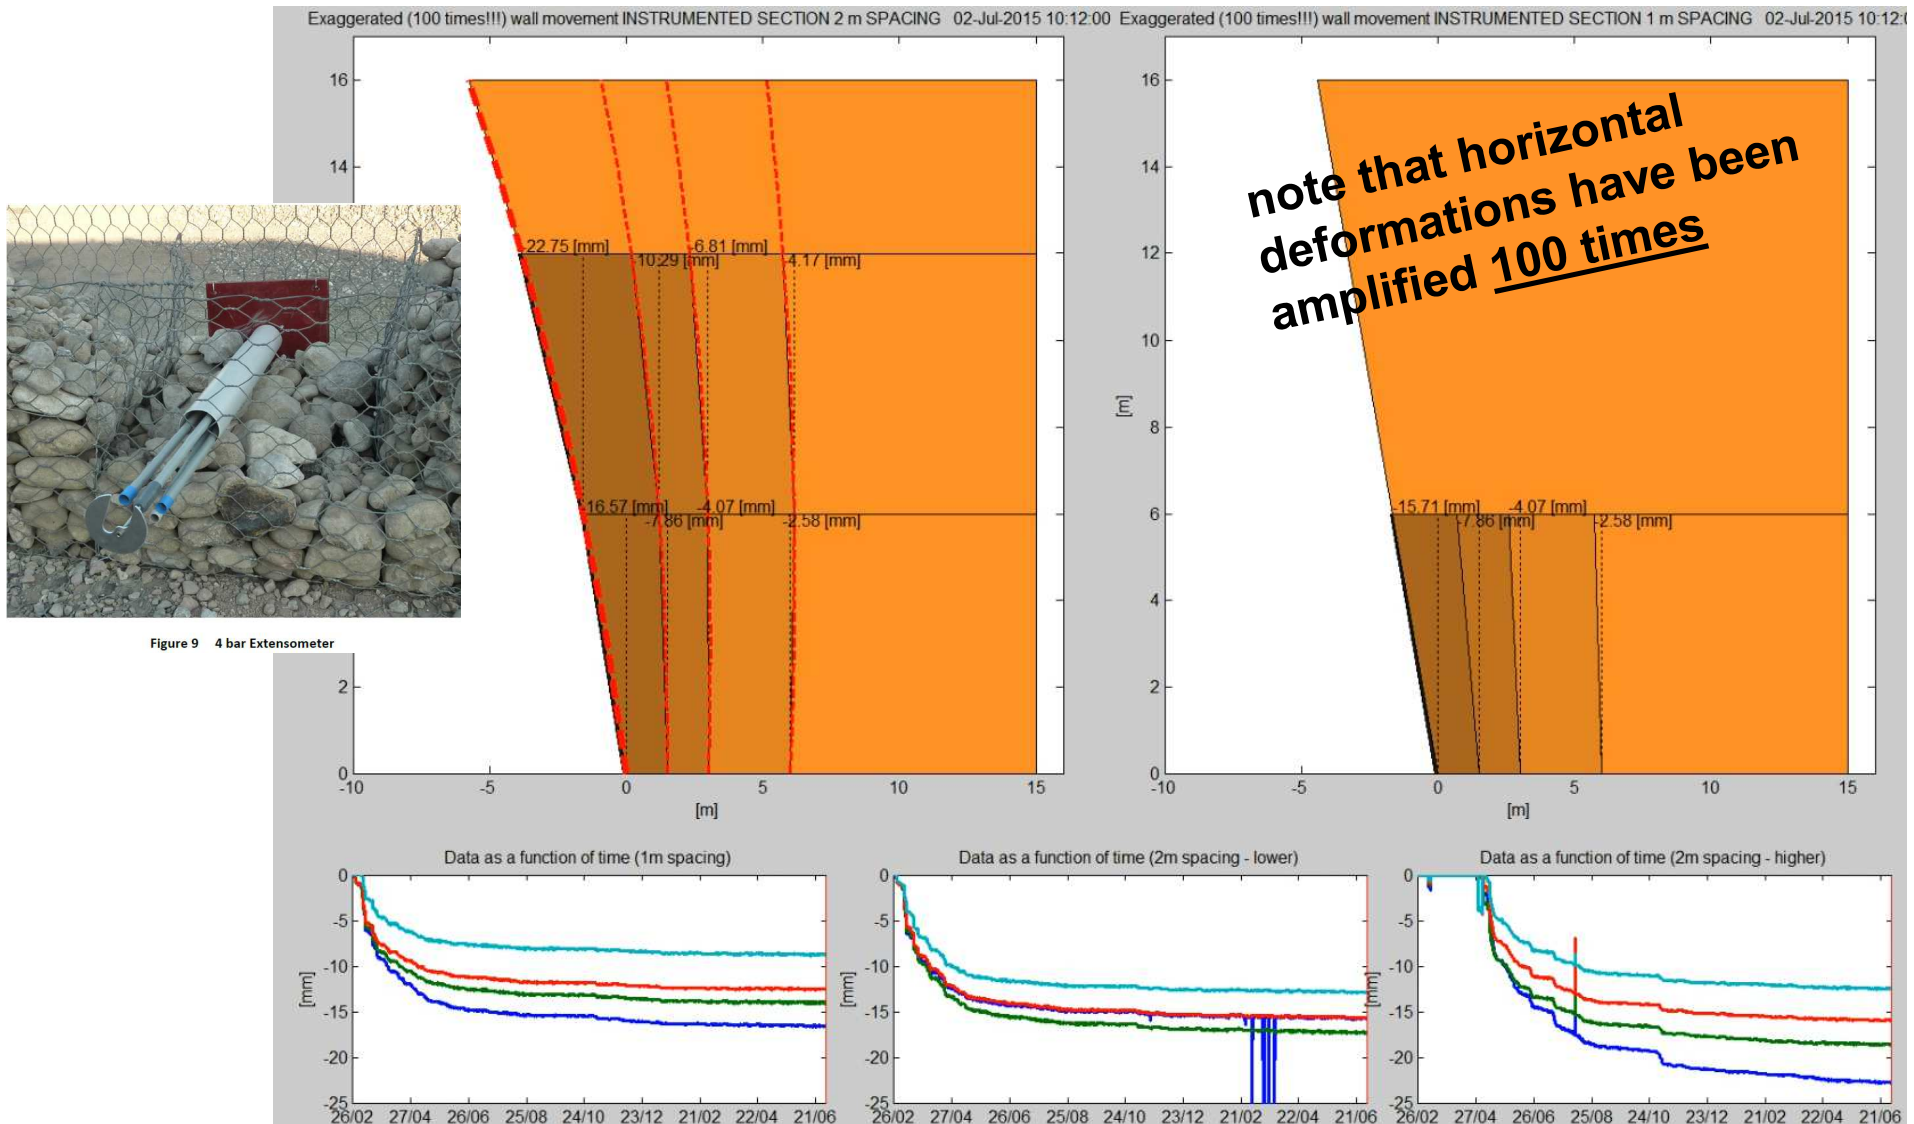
Horizontal Movement Section 2 Station 0+410, 2 m Vertical Spacing
